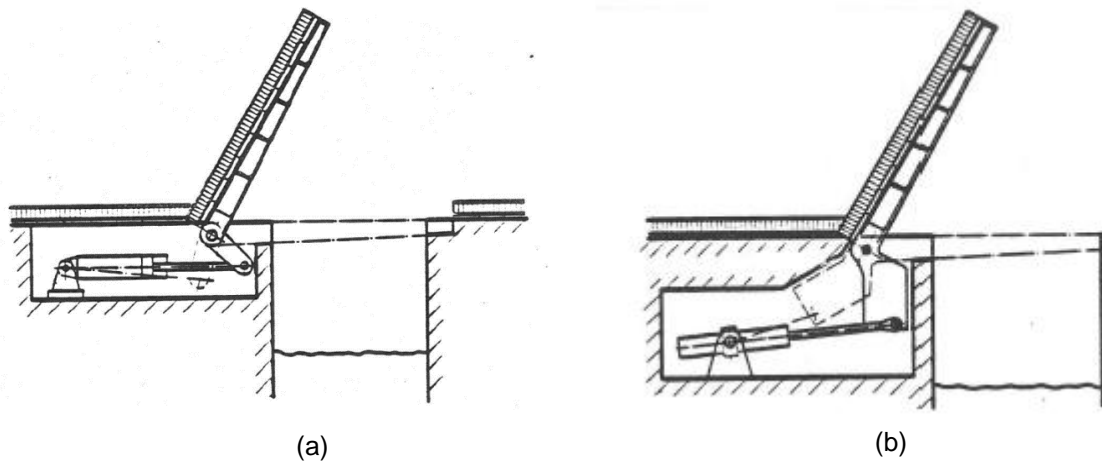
(a) Bascule bridge with fixed pivot (b) Bascule bridge with fixed pivot and counterweight (KGAL, 2017)
